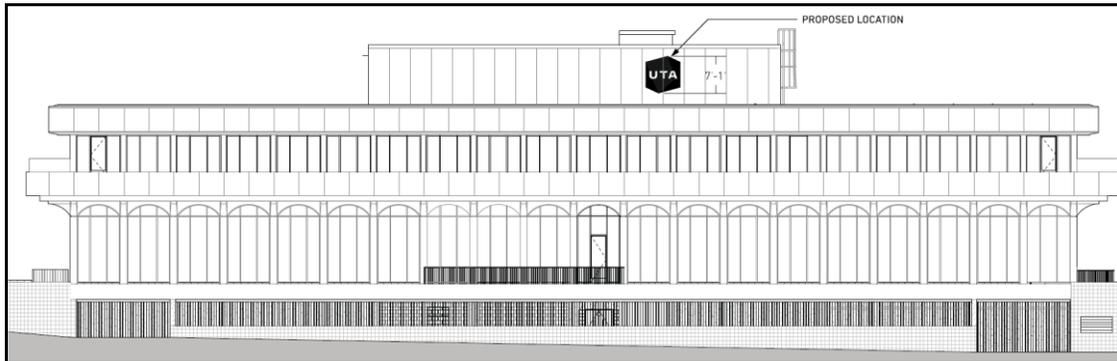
Proposed sign on façade fronting Rosa L. Parks Blvd (west elevation).
